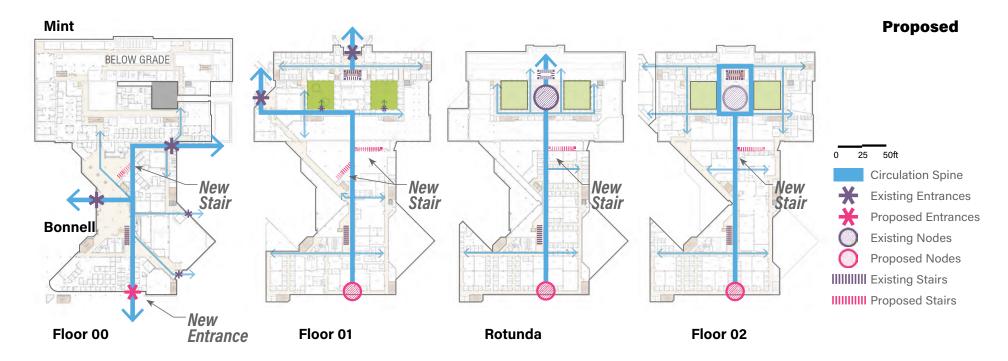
Proposed circulation improvements within Mint and Bonnell Buildings
